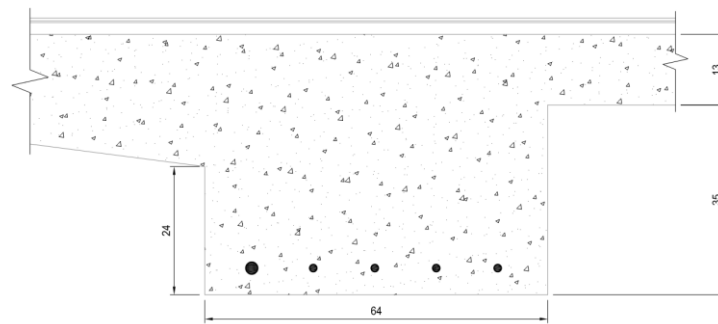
Typical Transverse Beam Cross-Section Dimensions in Centimeters [16]
